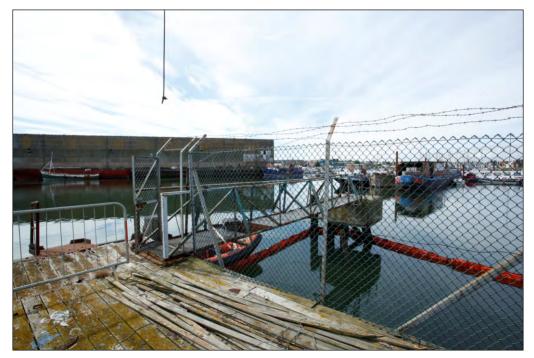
Deck of jetty, south-east end, showing south-west mooring dolphin and steel walkway, looking south-west
